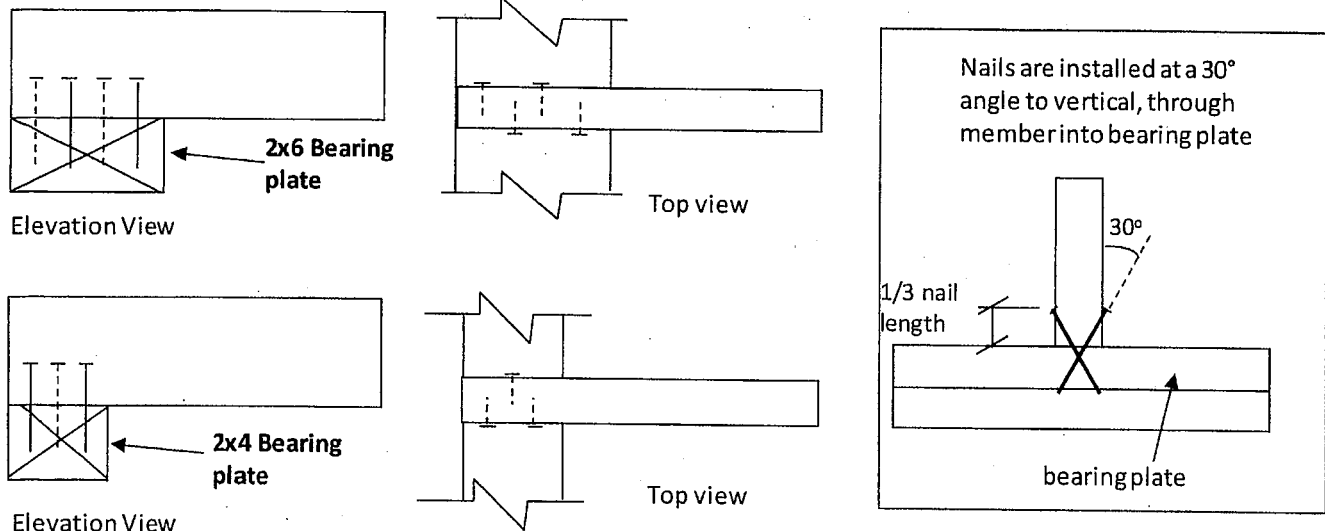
Toe-Nailing Rafter / Ceiling Member to Girder Truss
